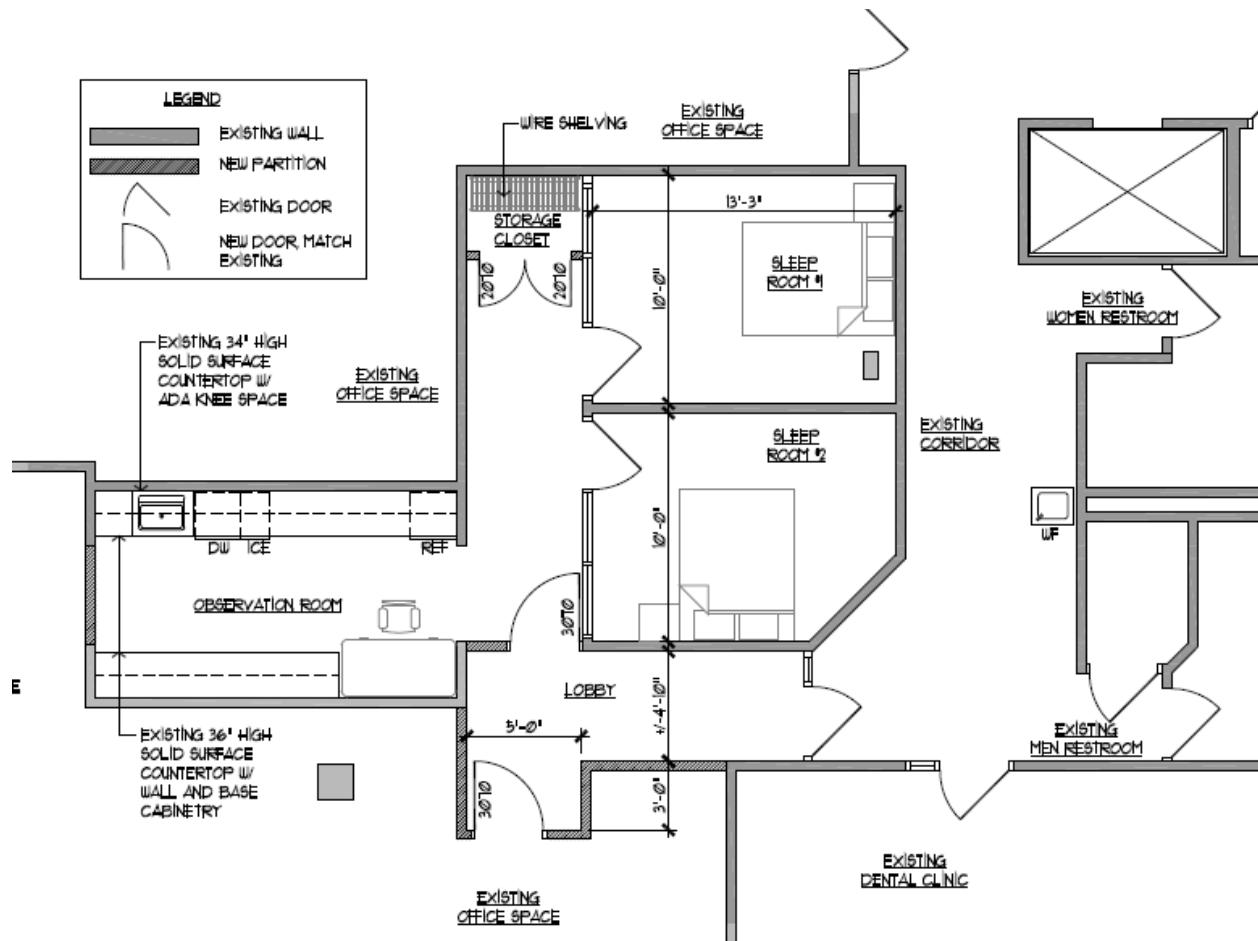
Close-up of the proposed Sleep Clinic Floor Plan
